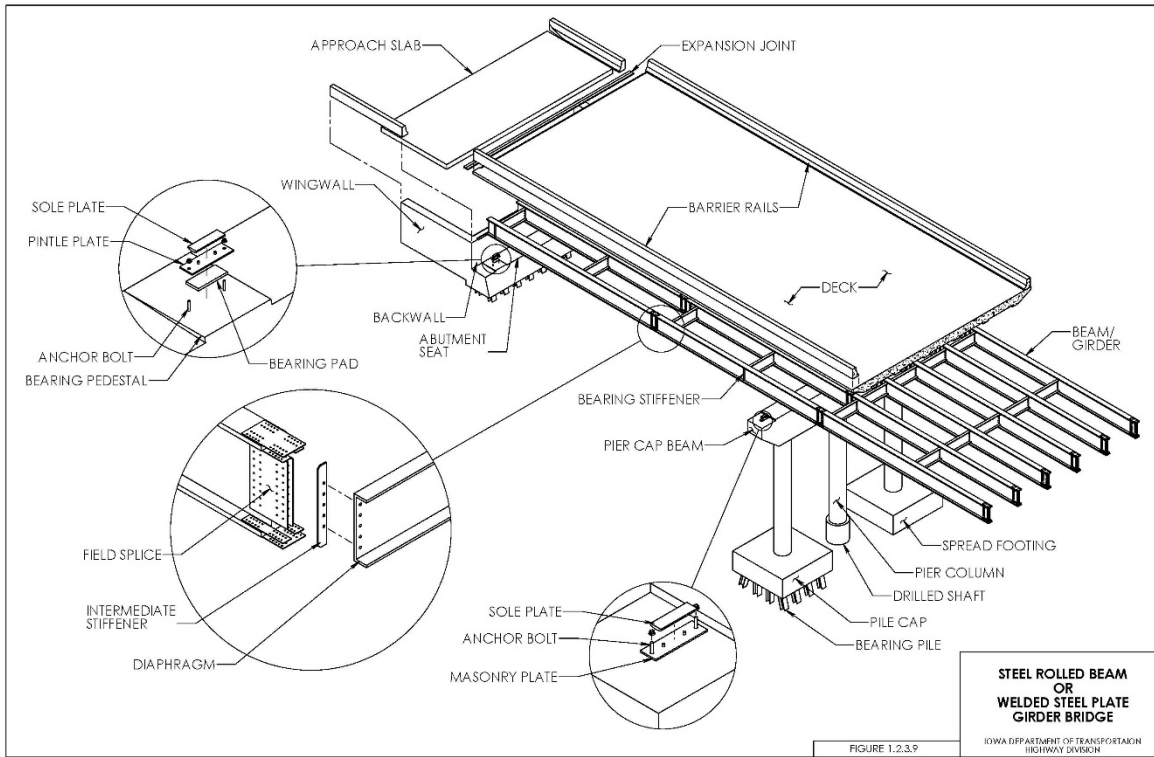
Steel Rolled Beam or Welded Steel Plate Girder Bridge Components
